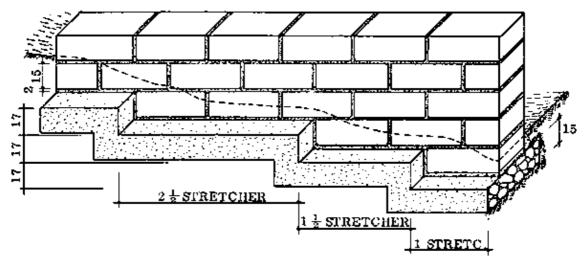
STEPPED FOUNDATION WITH SANDCRETE FOOTING
